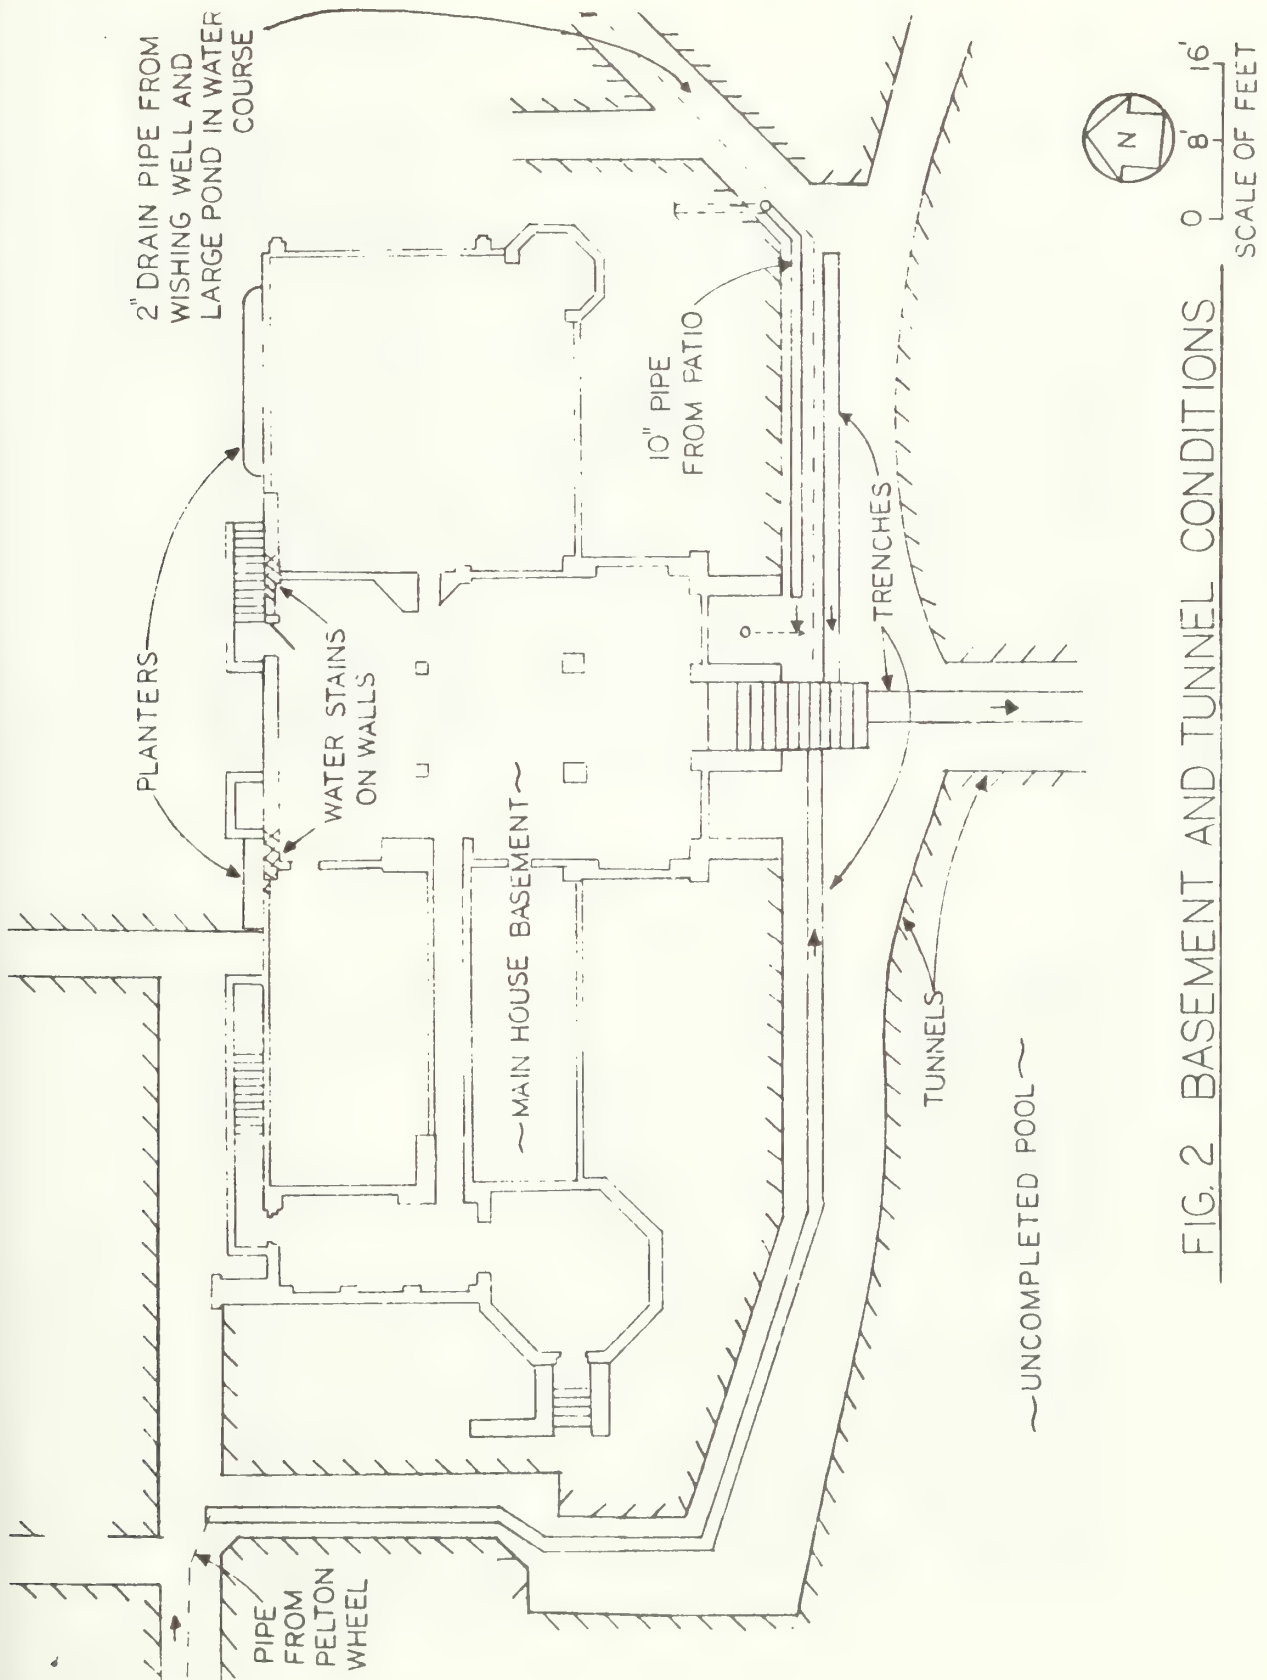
BASEMENT AND TUNNEL CONDITIONS
